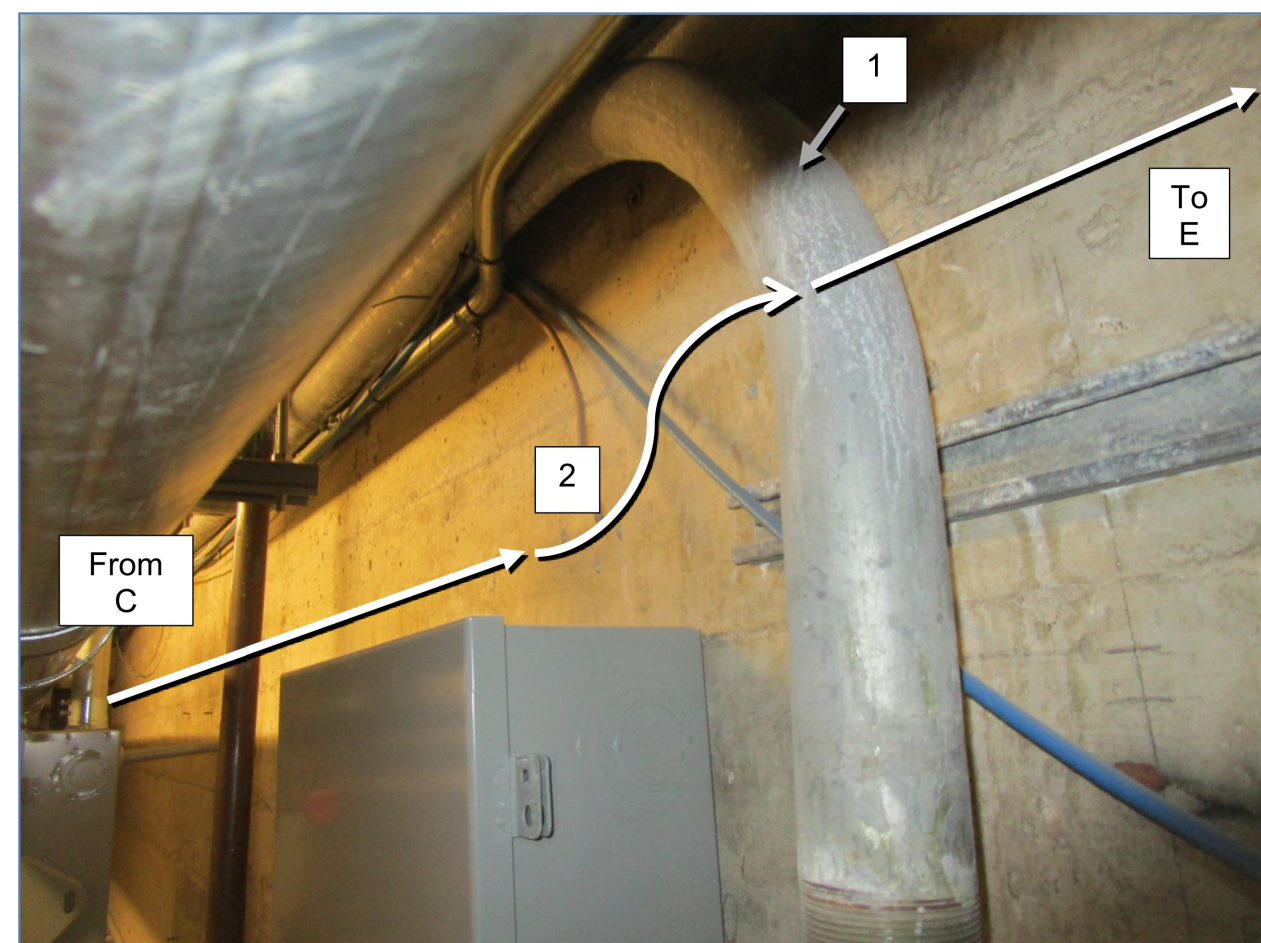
Location D, jog in conduit and removal of abandoned 50 mm conduit
